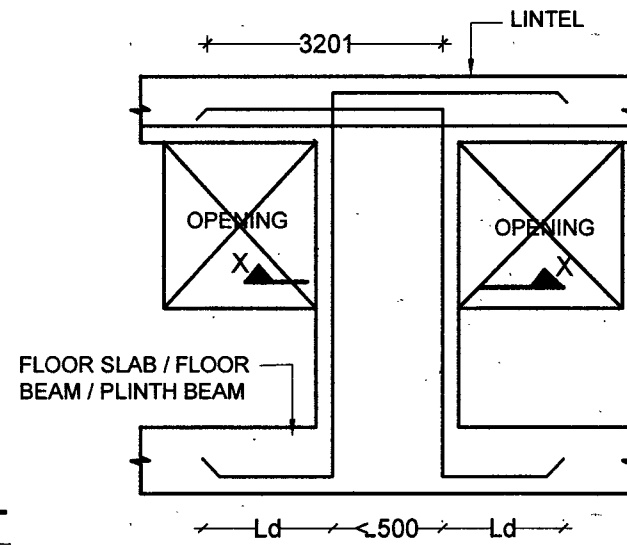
ADDITIONAL REINFORCEMENT AT RE-ENTRANT CORNERS
